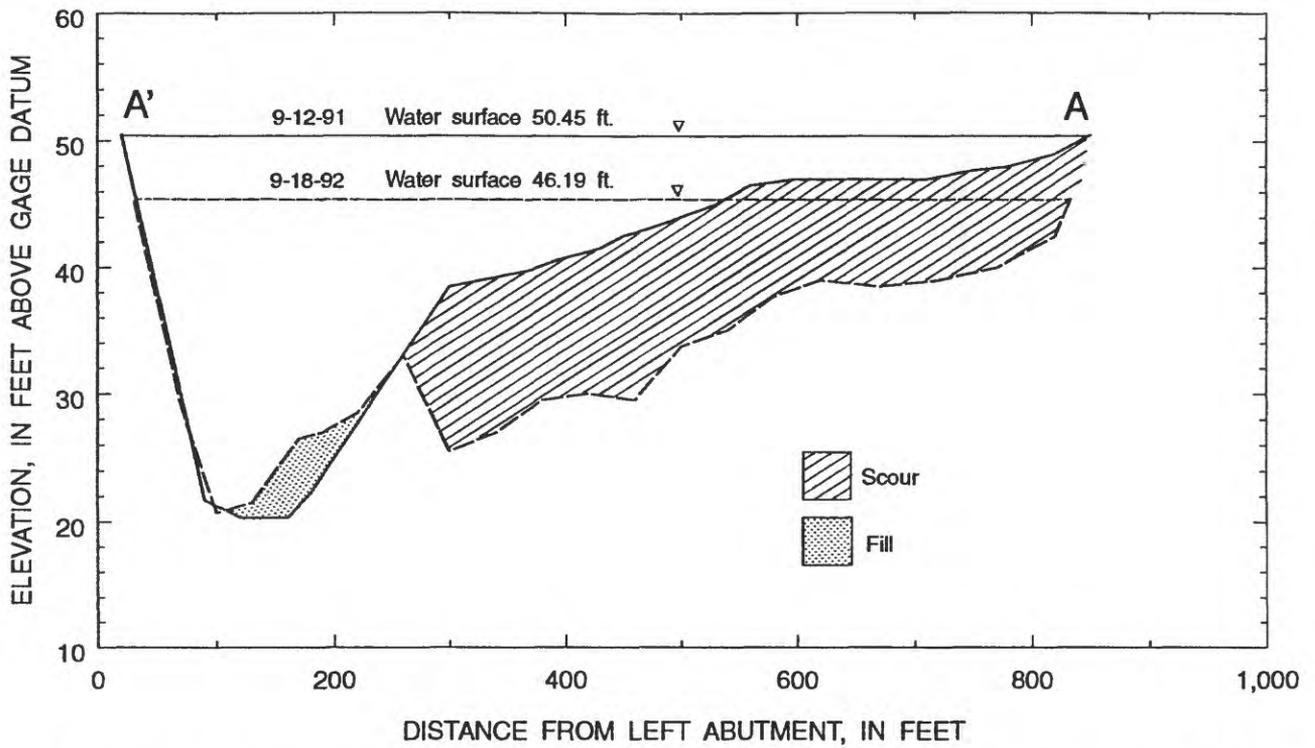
Cross-section profile, downstream side of Bridge 342, showing scour and fill characteristics (see figure 10 for location of A-A').
